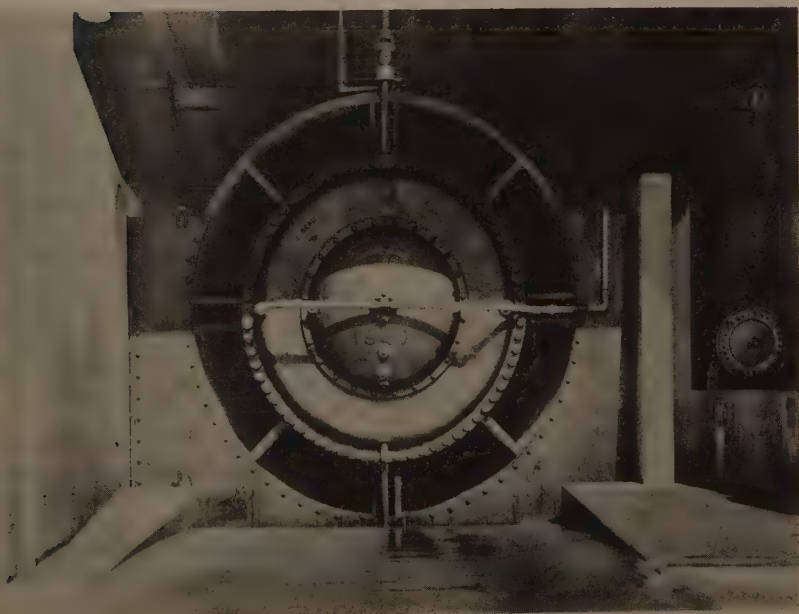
Two-rack conduit (horizontal) encasing piezometer
